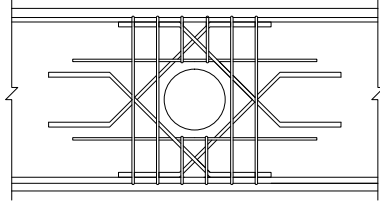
Typical detailing of reinforcement around opening in a heavily loaded member. The vertical component of the inclined reinforcement provides resistance for beam-type failure, but is mainly placed for crack control.
